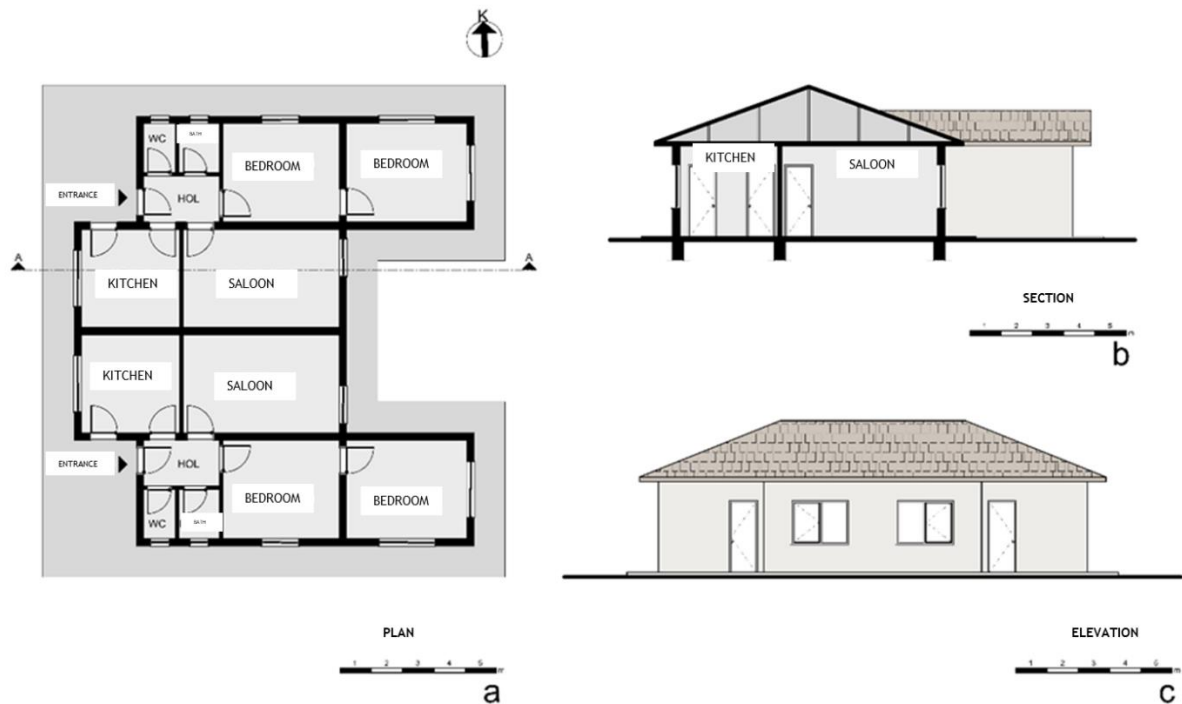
A1 type worker's housing a) plan, b) section, c) elevation (Adapted from Karabük Municipality, 2020).
